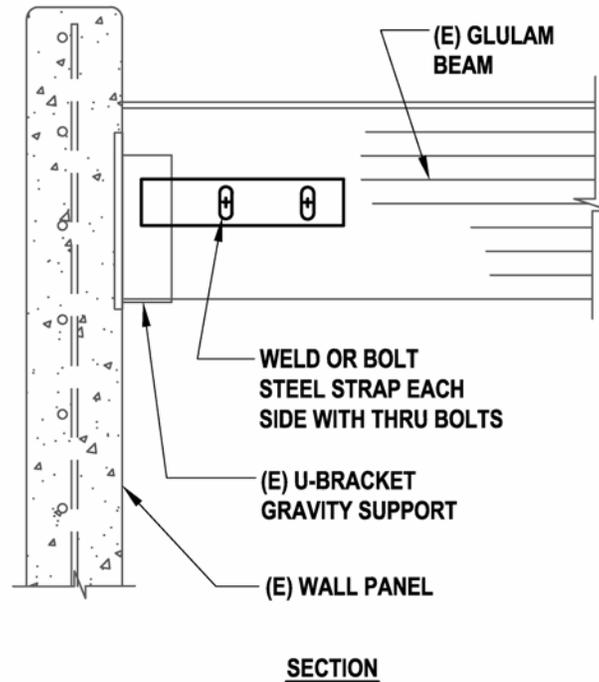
Enhanced Girder Connection at U-hanger
